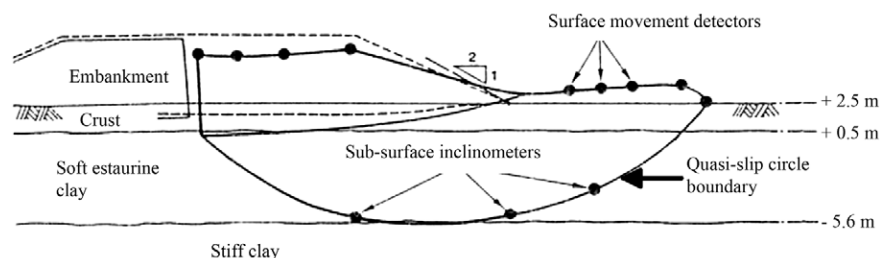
Failure mode of embankment and foundation (modified after Brand & Premchitt, 1989).
